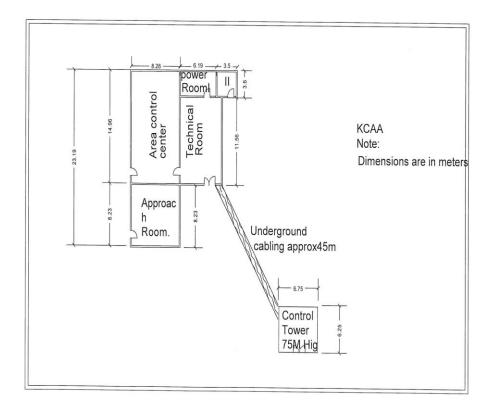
Layout of JKIA ACC, Approach, Equipment and Control Tower Rooms at JKIA
